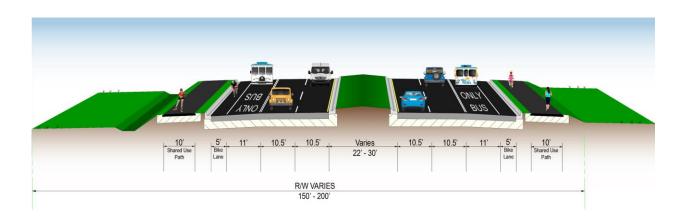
Typical Section for Bridge Build Condition and At-Grade Roadway Sections
